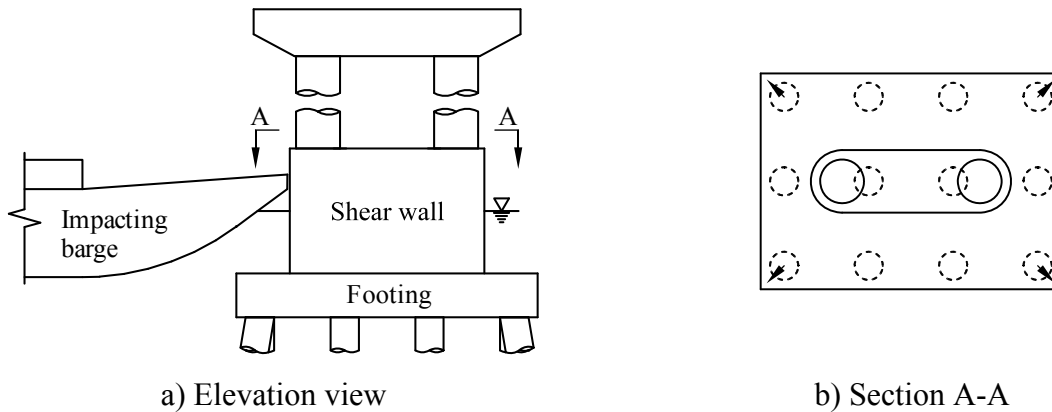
Pile-founded alternative design with submerged footing and shear wall (pier 4)
